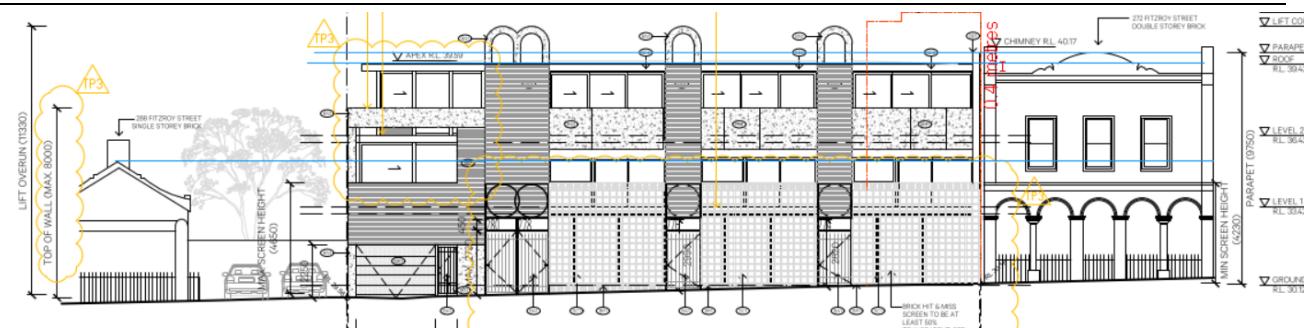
shows the proposed street elevation with blue lines showing relative heights to adjoining buildings.
